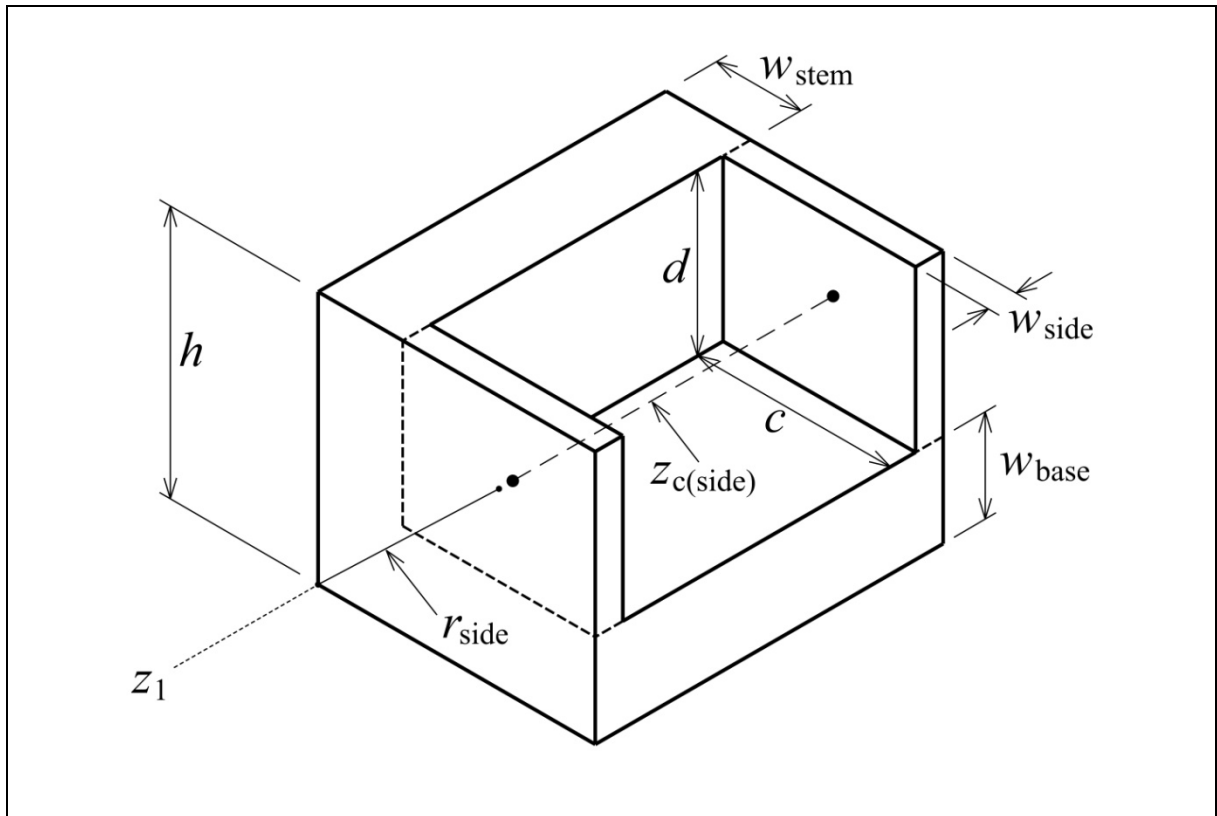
An L-shaped Barrier with Side Walls and Coordinate Systems
